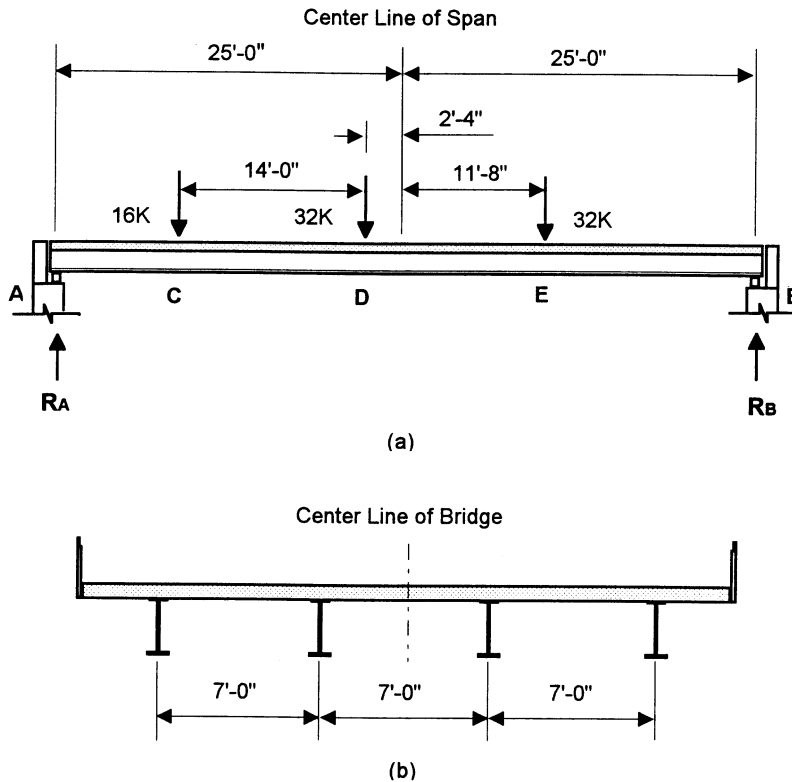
(a) Elevation of the steel girder bridge under truck load HS20-44. (b) Section of the steel girder bridge.
